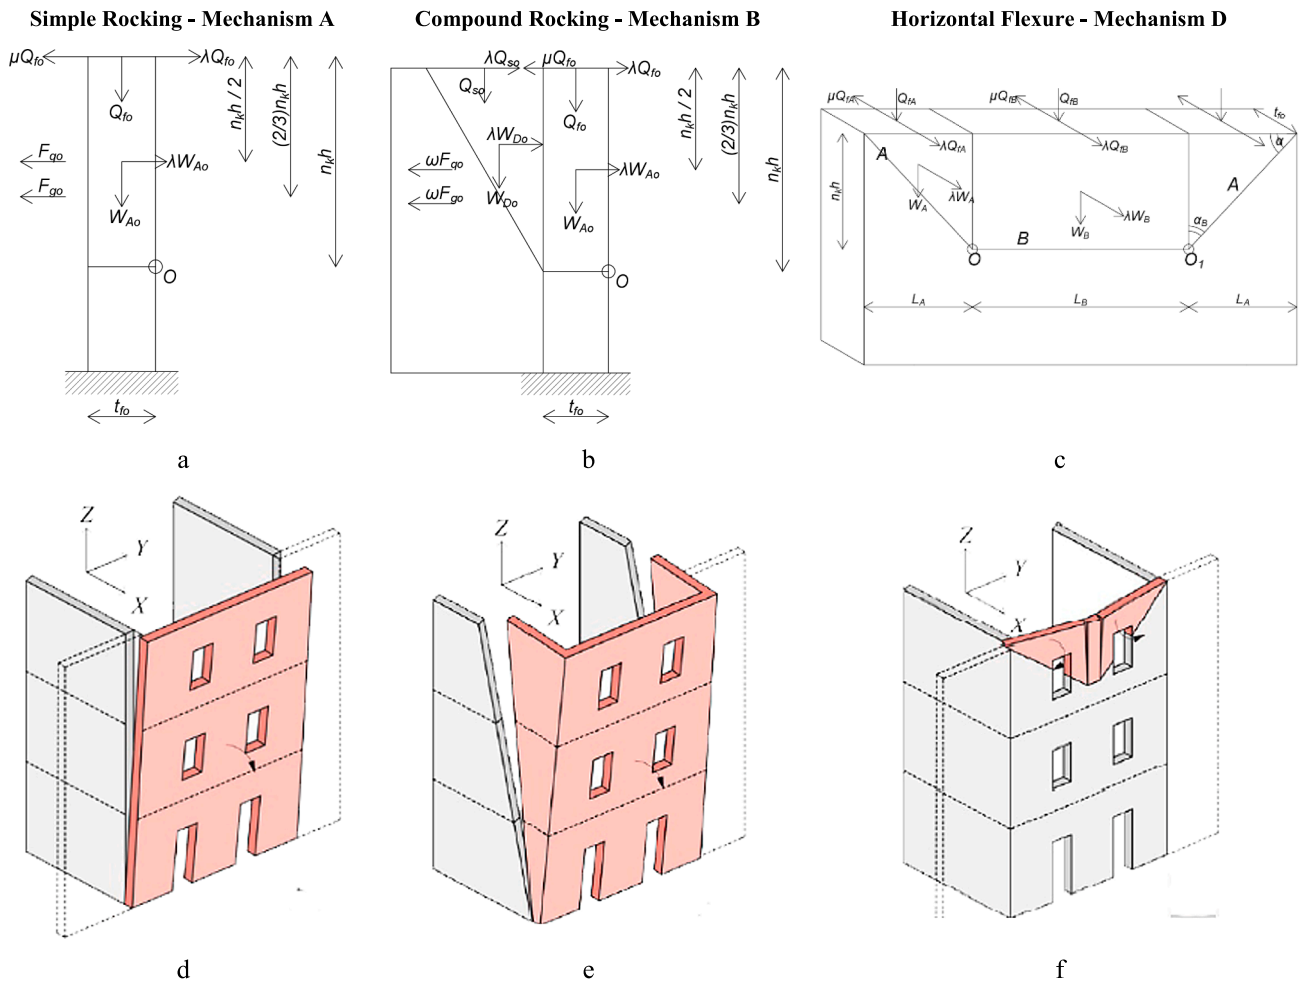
Scheme of internal and external actions in simple rocking (a), compound rocking (b) and horizontal flexure mechanism(c); 3D schematic view of simple rocking (d), compound rocking (e) and horizontal flexure (e) mechanism, . adapted from [3]
